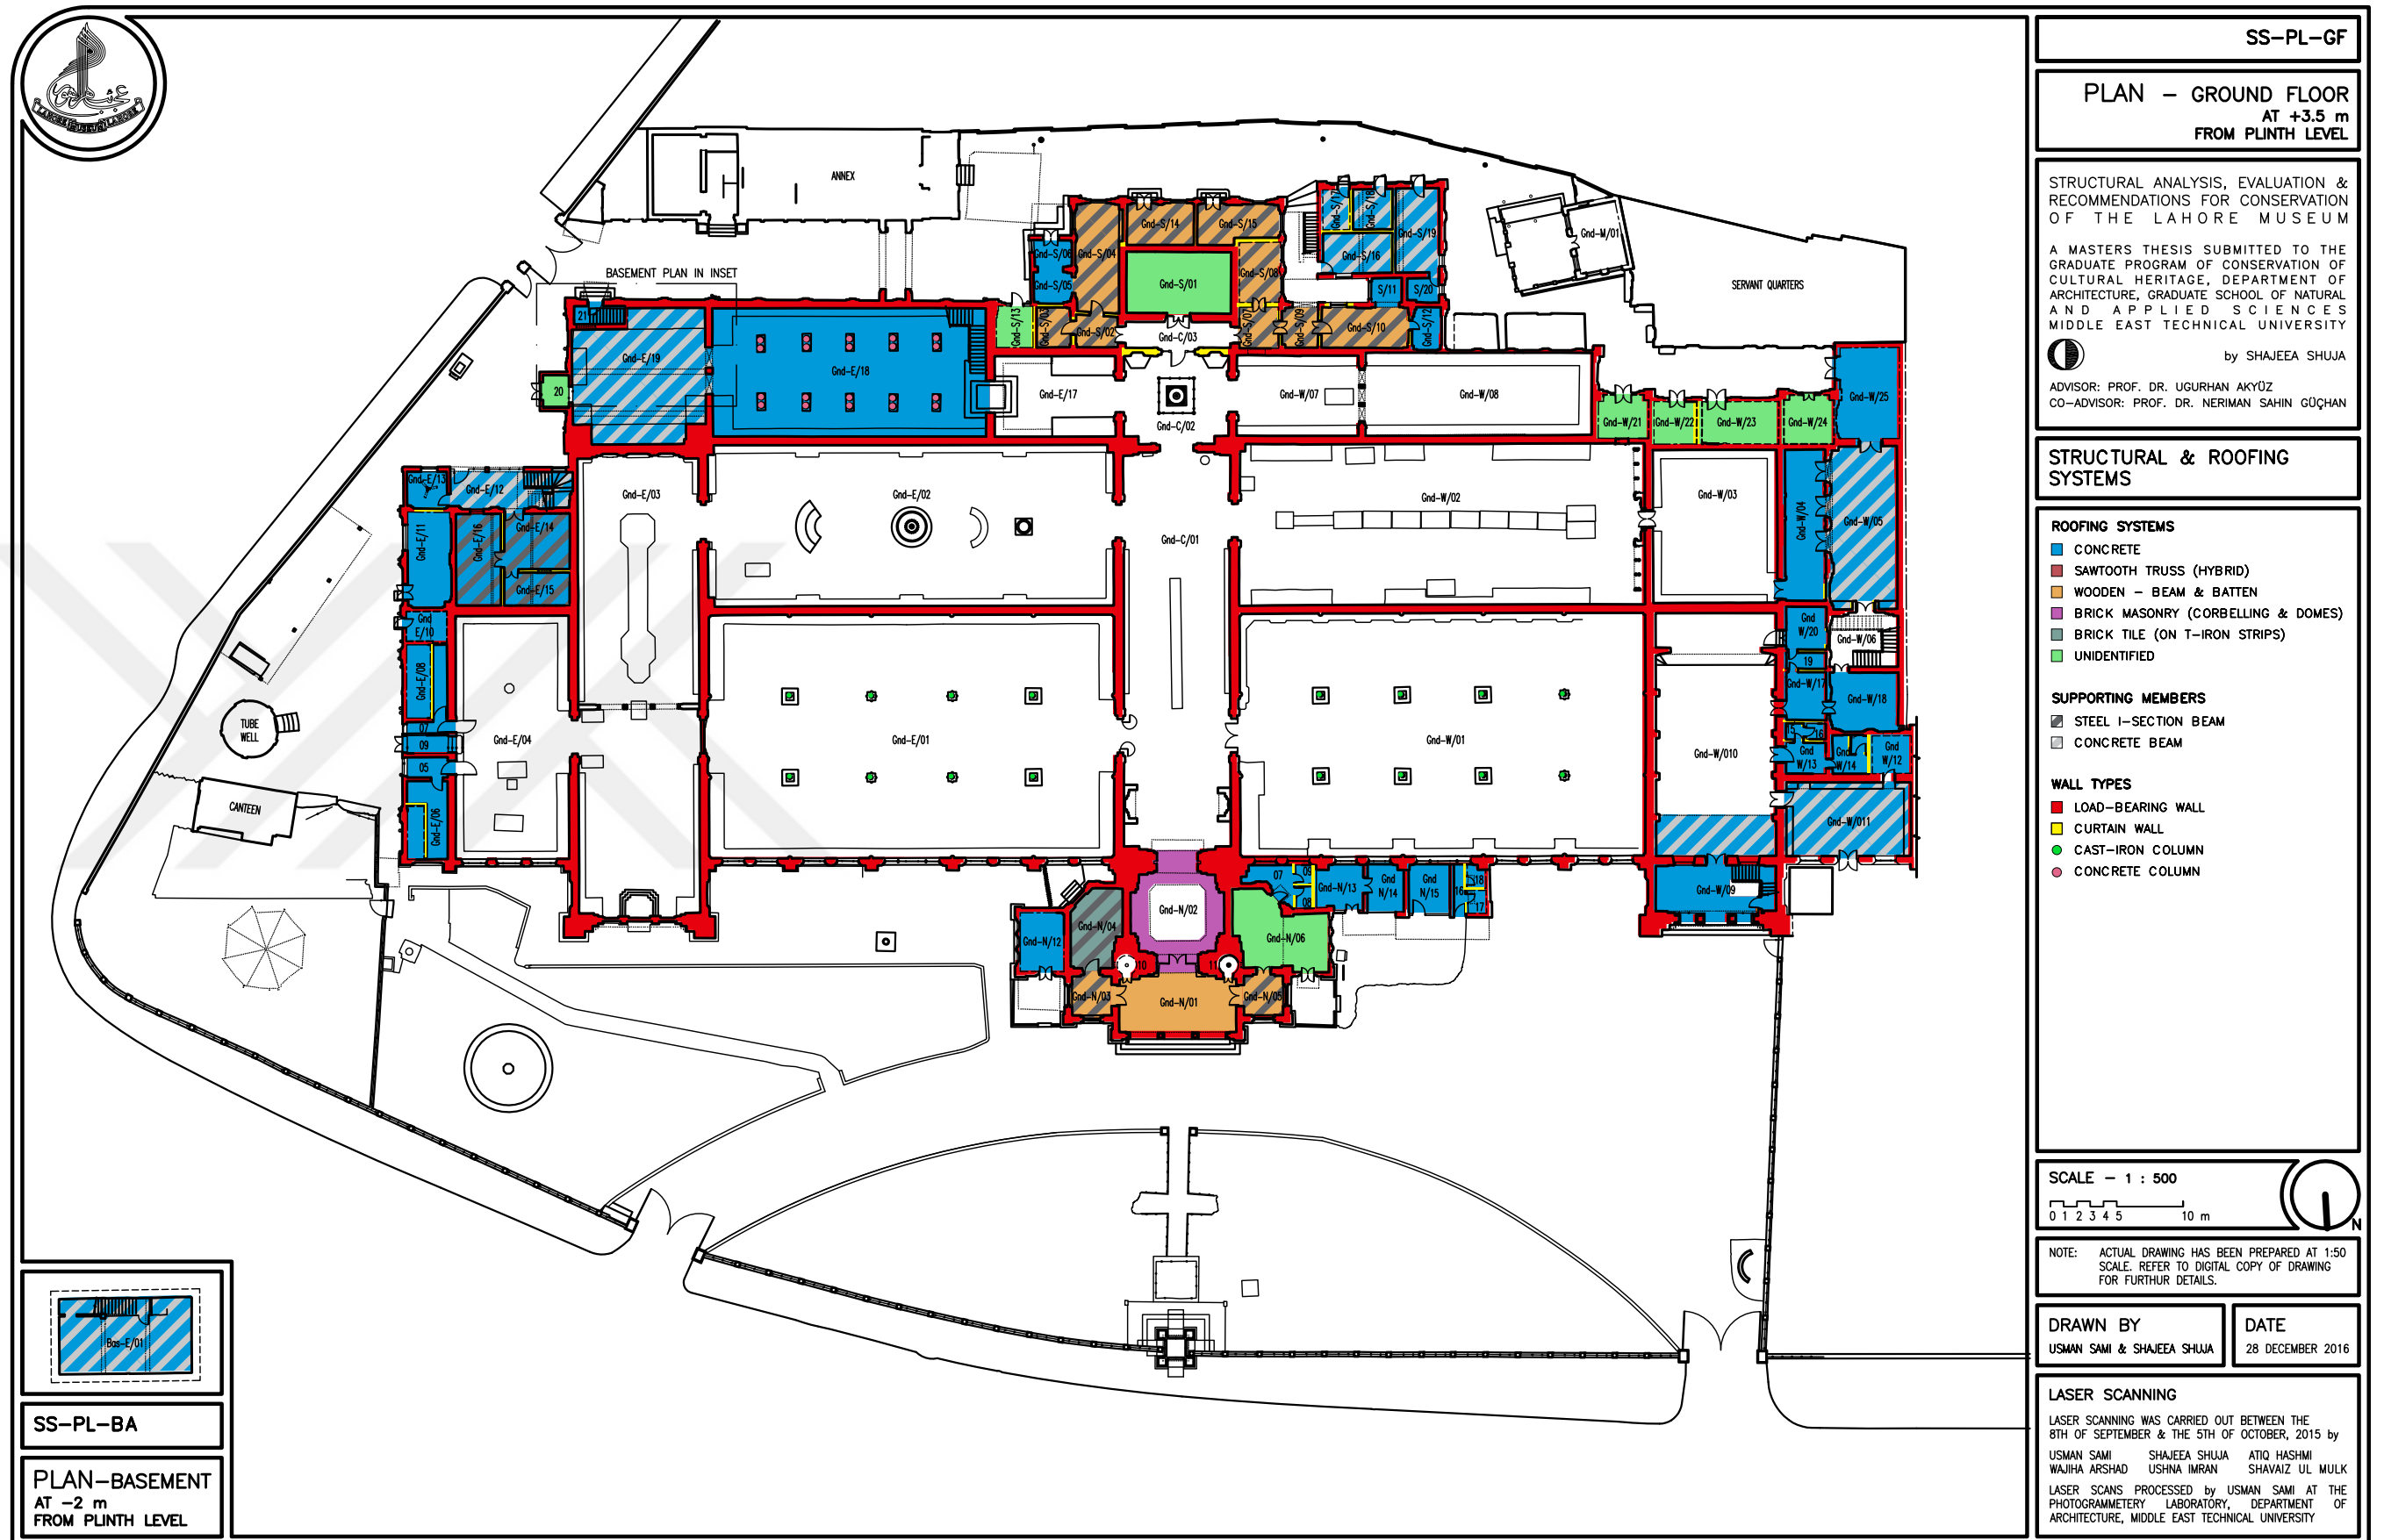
SS-PL-GF / BA – Structural & Roofing Systems – Plan – Ground Floor (2016)
